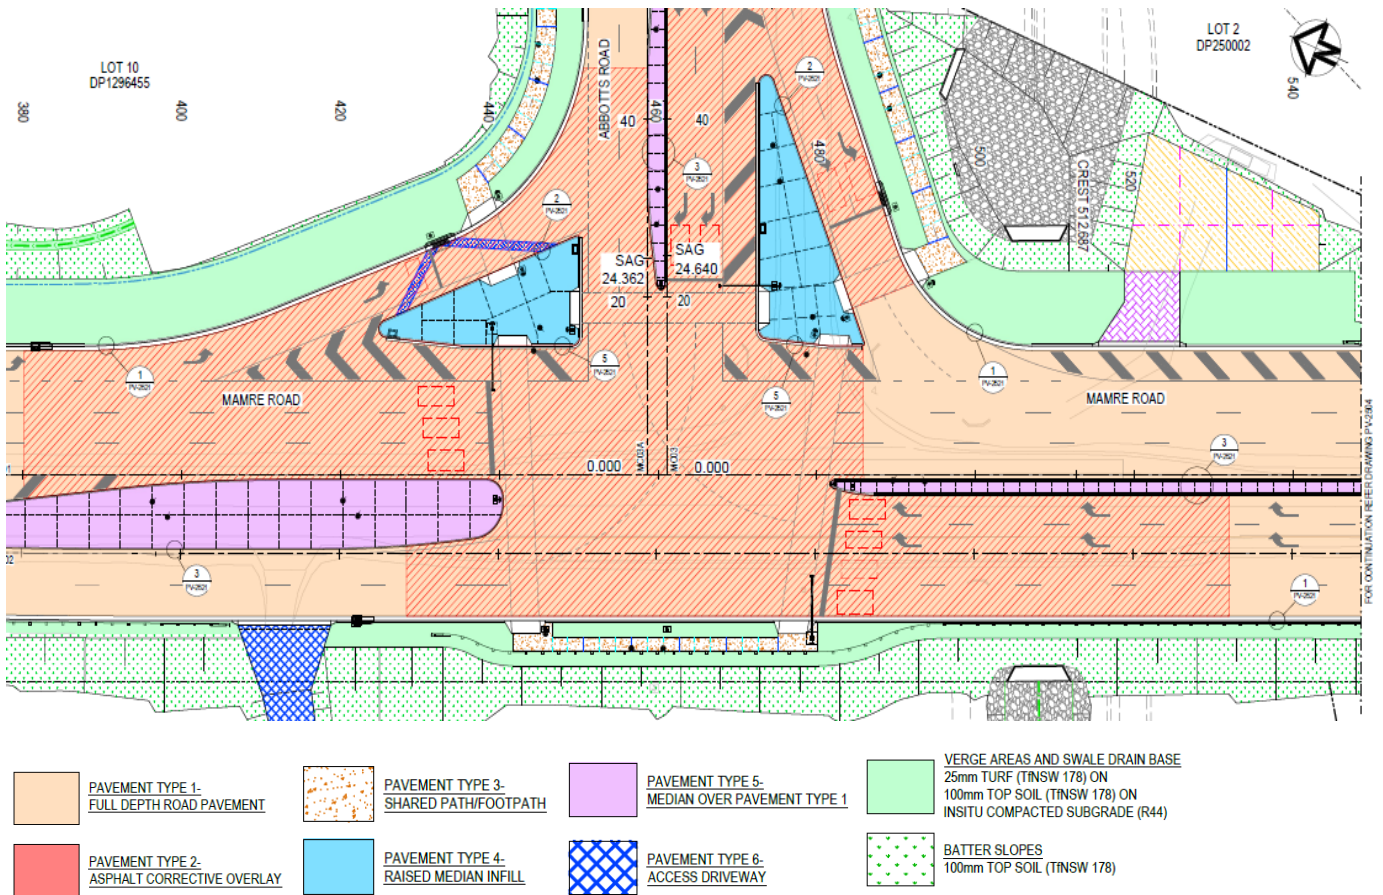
Proposed Mamre Road and Abbotts Road Intersection pavement sheet
